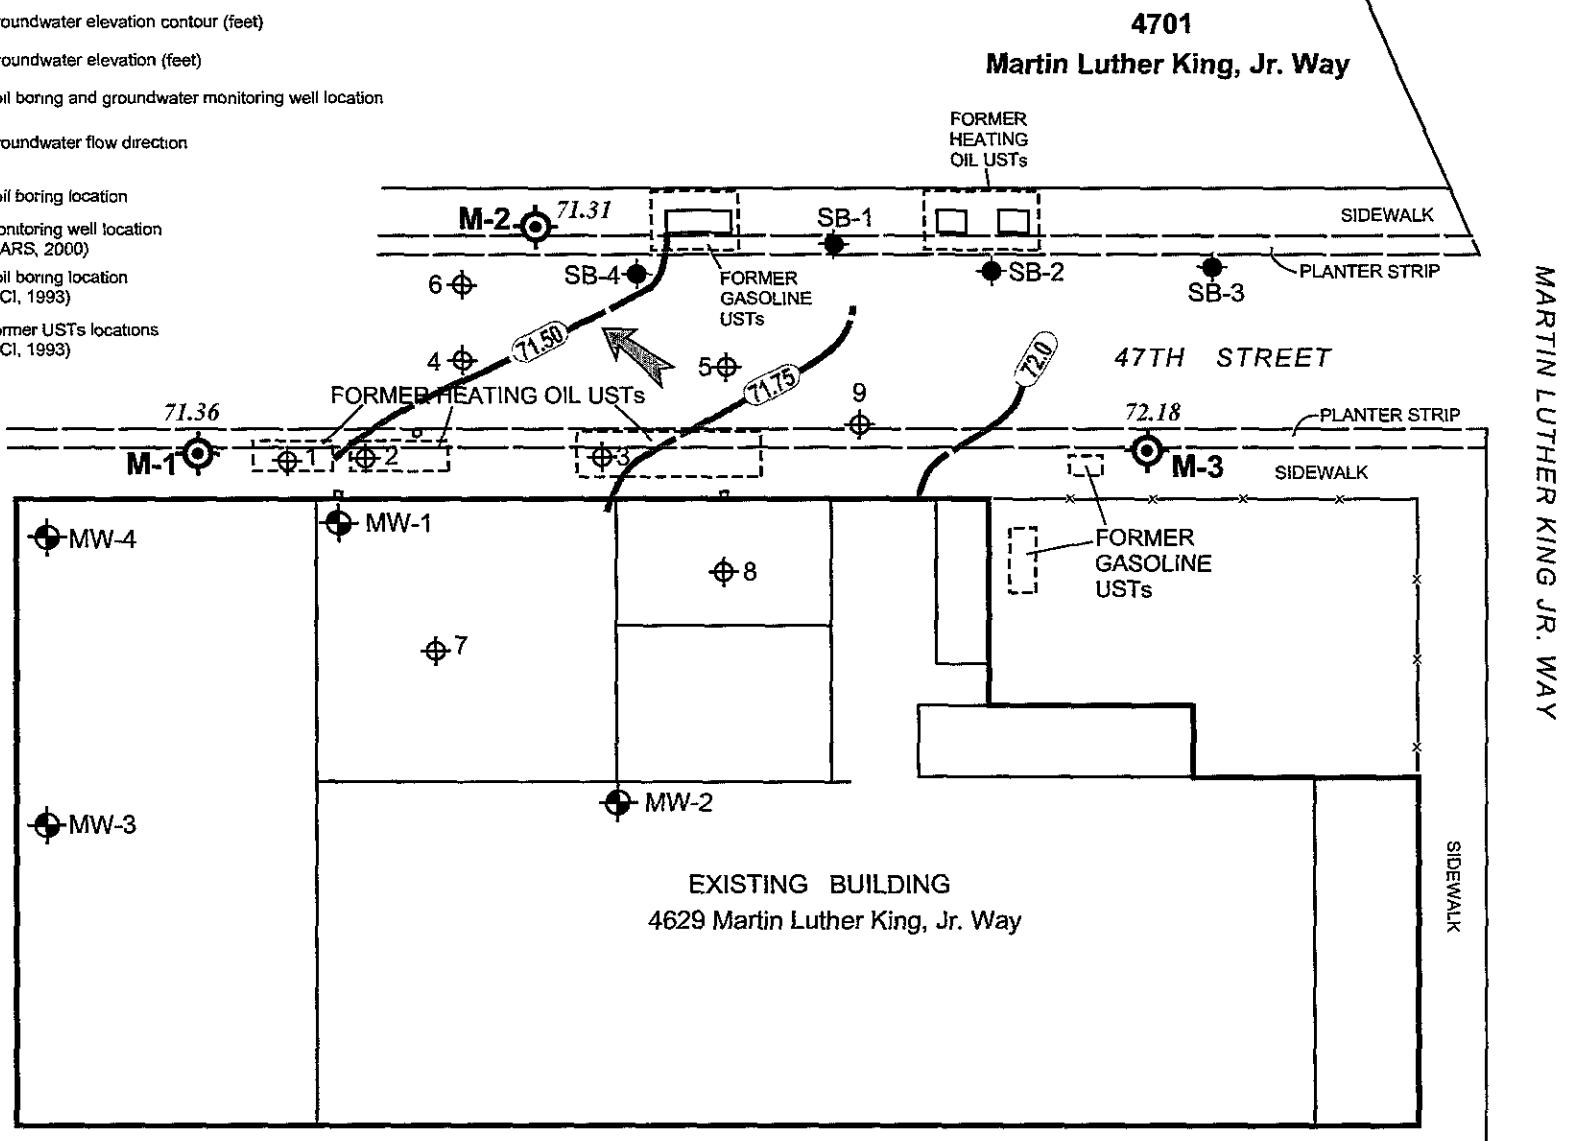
GROUNDWATER ELEVATION - MAY 16, 2002
